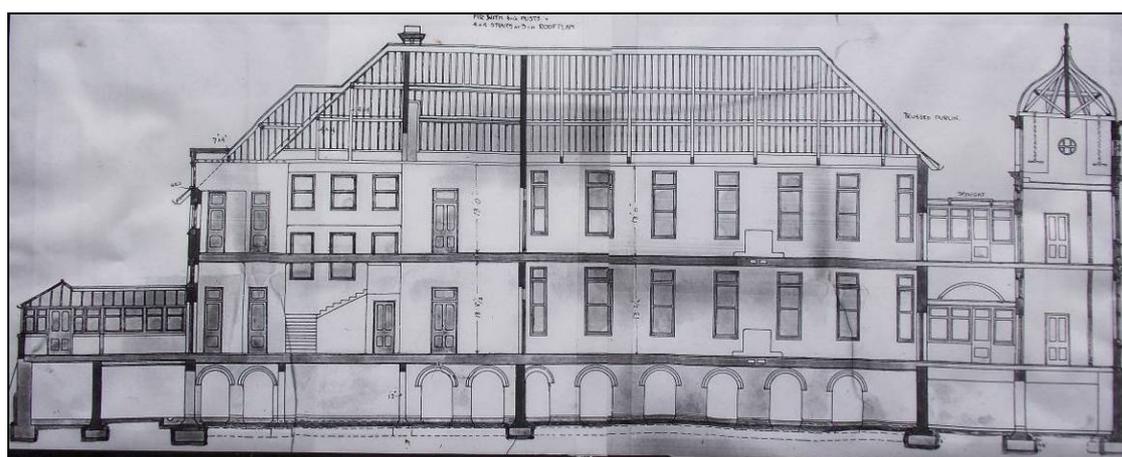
Copy of original architectural drawing of Building 45 showing the longitudinal section.
